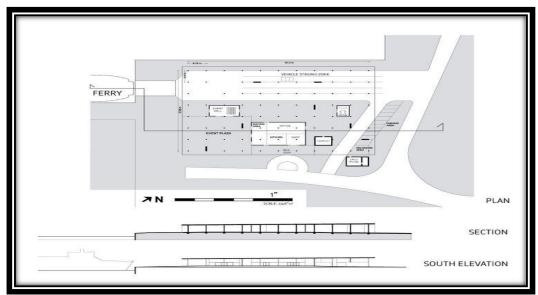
show the plan section and south Elevation of Naoshima Terminal
